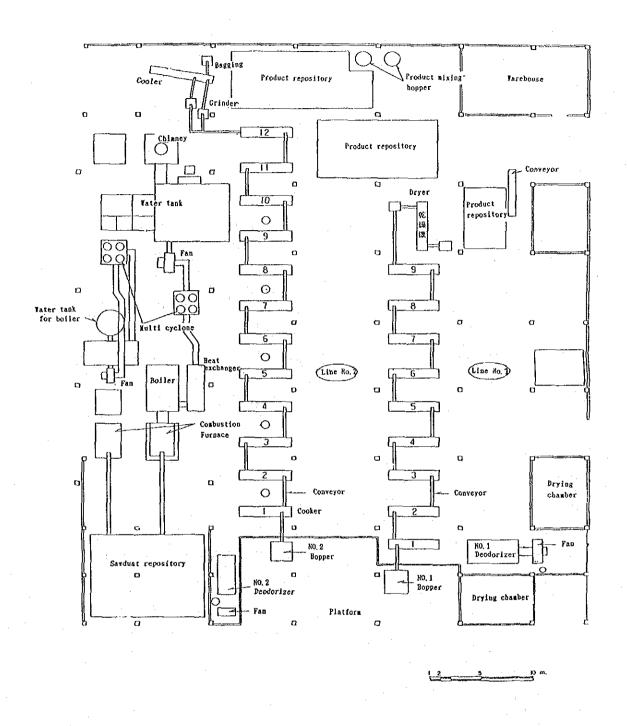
Layout in the Factory (Fish Meal Plant A)
